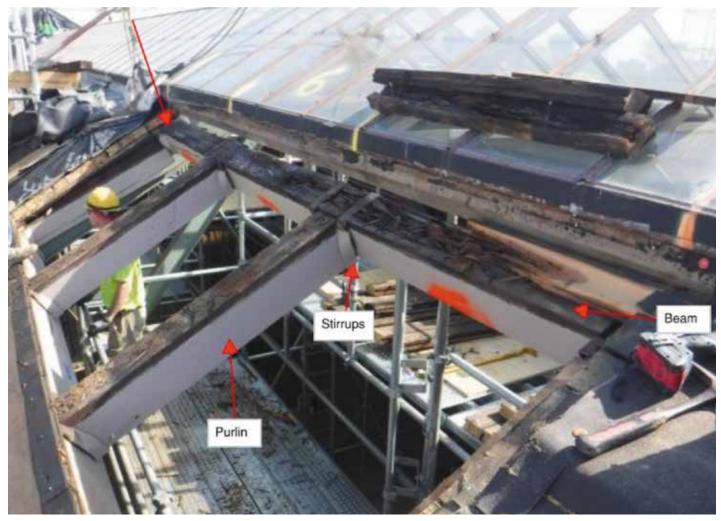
Decking removed, exposing water-damaged timber beam framing at base of original skylight curb. The beams ran north-south, intersecting with east-west purlin at regular intervals between the steel trusses. The purlin had to be removed to facilitate the replacement of the north-south beam.
